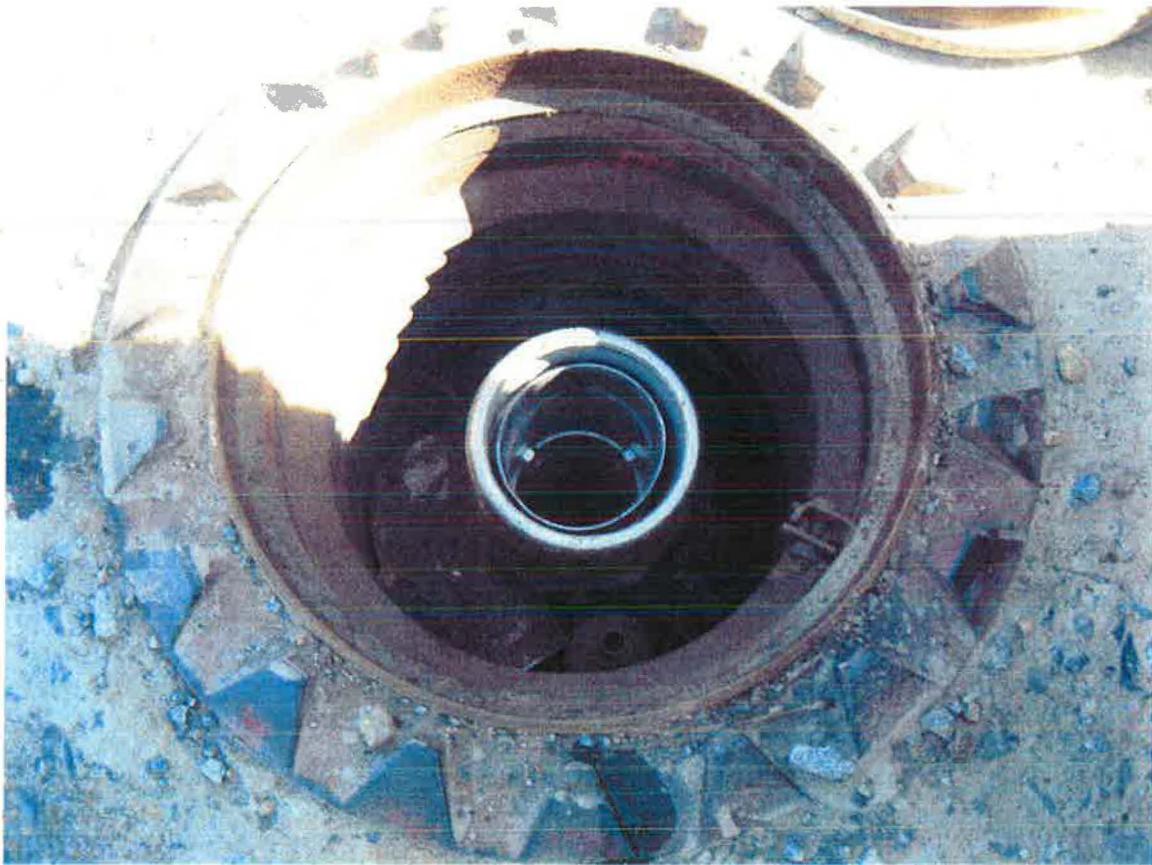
Tank 1 fill pipe and spill bucket. Flapper valve in fill pipe verified by inspectors.
